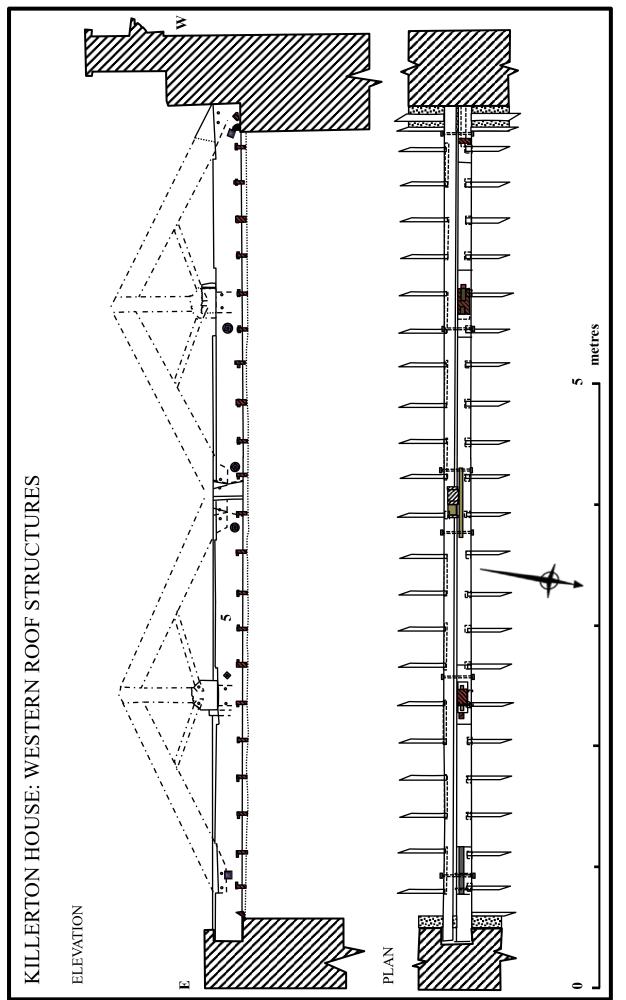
Elevation and plan of one of the late 18th-century trusses over the western part of the house with the missing elements of the original design restored.
